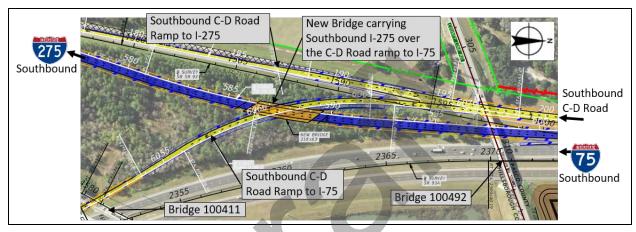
Preferred Alternative—C-D Road Diverge & New I-275 Bridge over C-D Road Ramp
